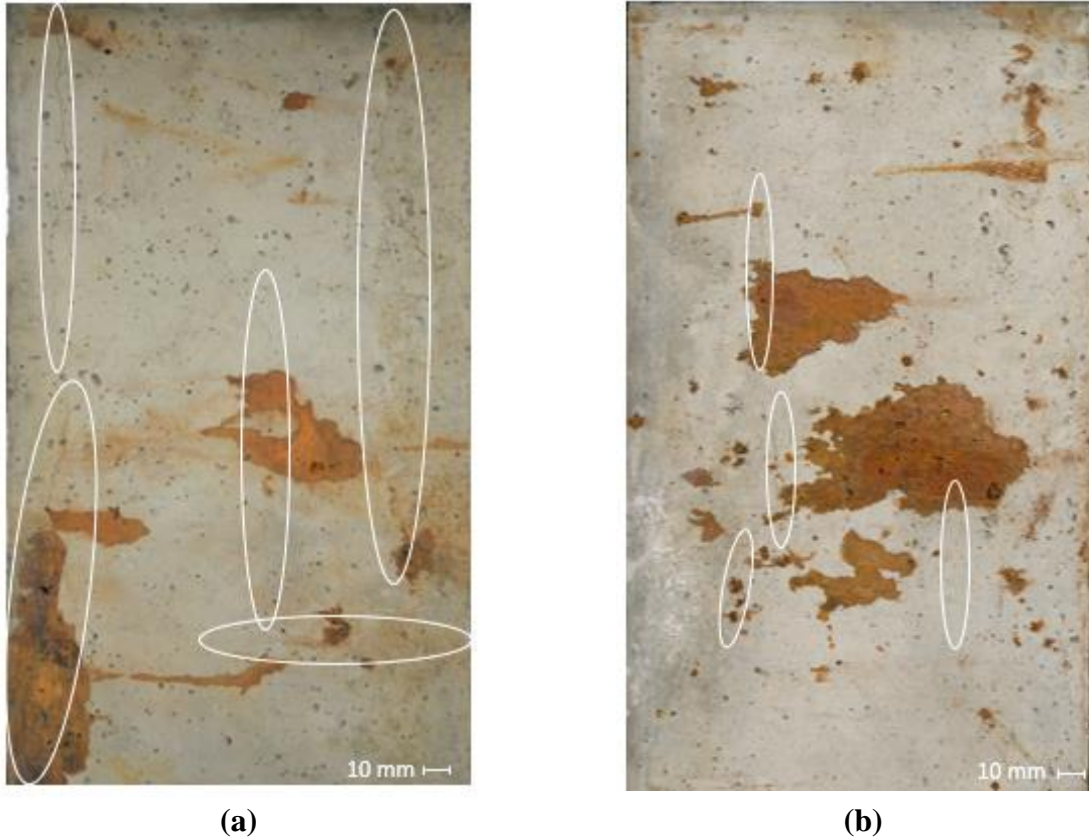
6: Surface cracking and corrosion egress following accelerated corrosion for C-c (a) and HyFRC-c (b) at the end of the accelerated corrosion test.
